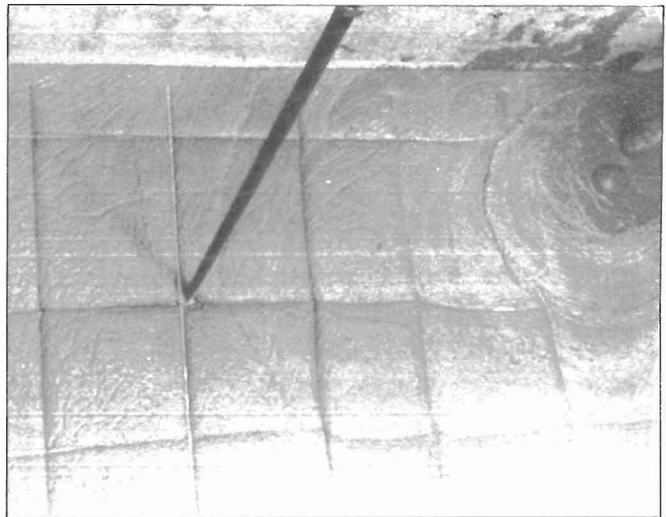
First pour of lightweight concrete up to level of top rebar cage. Note texture of flow by slight depression of rebar as lightweight concrete covers rebar.
